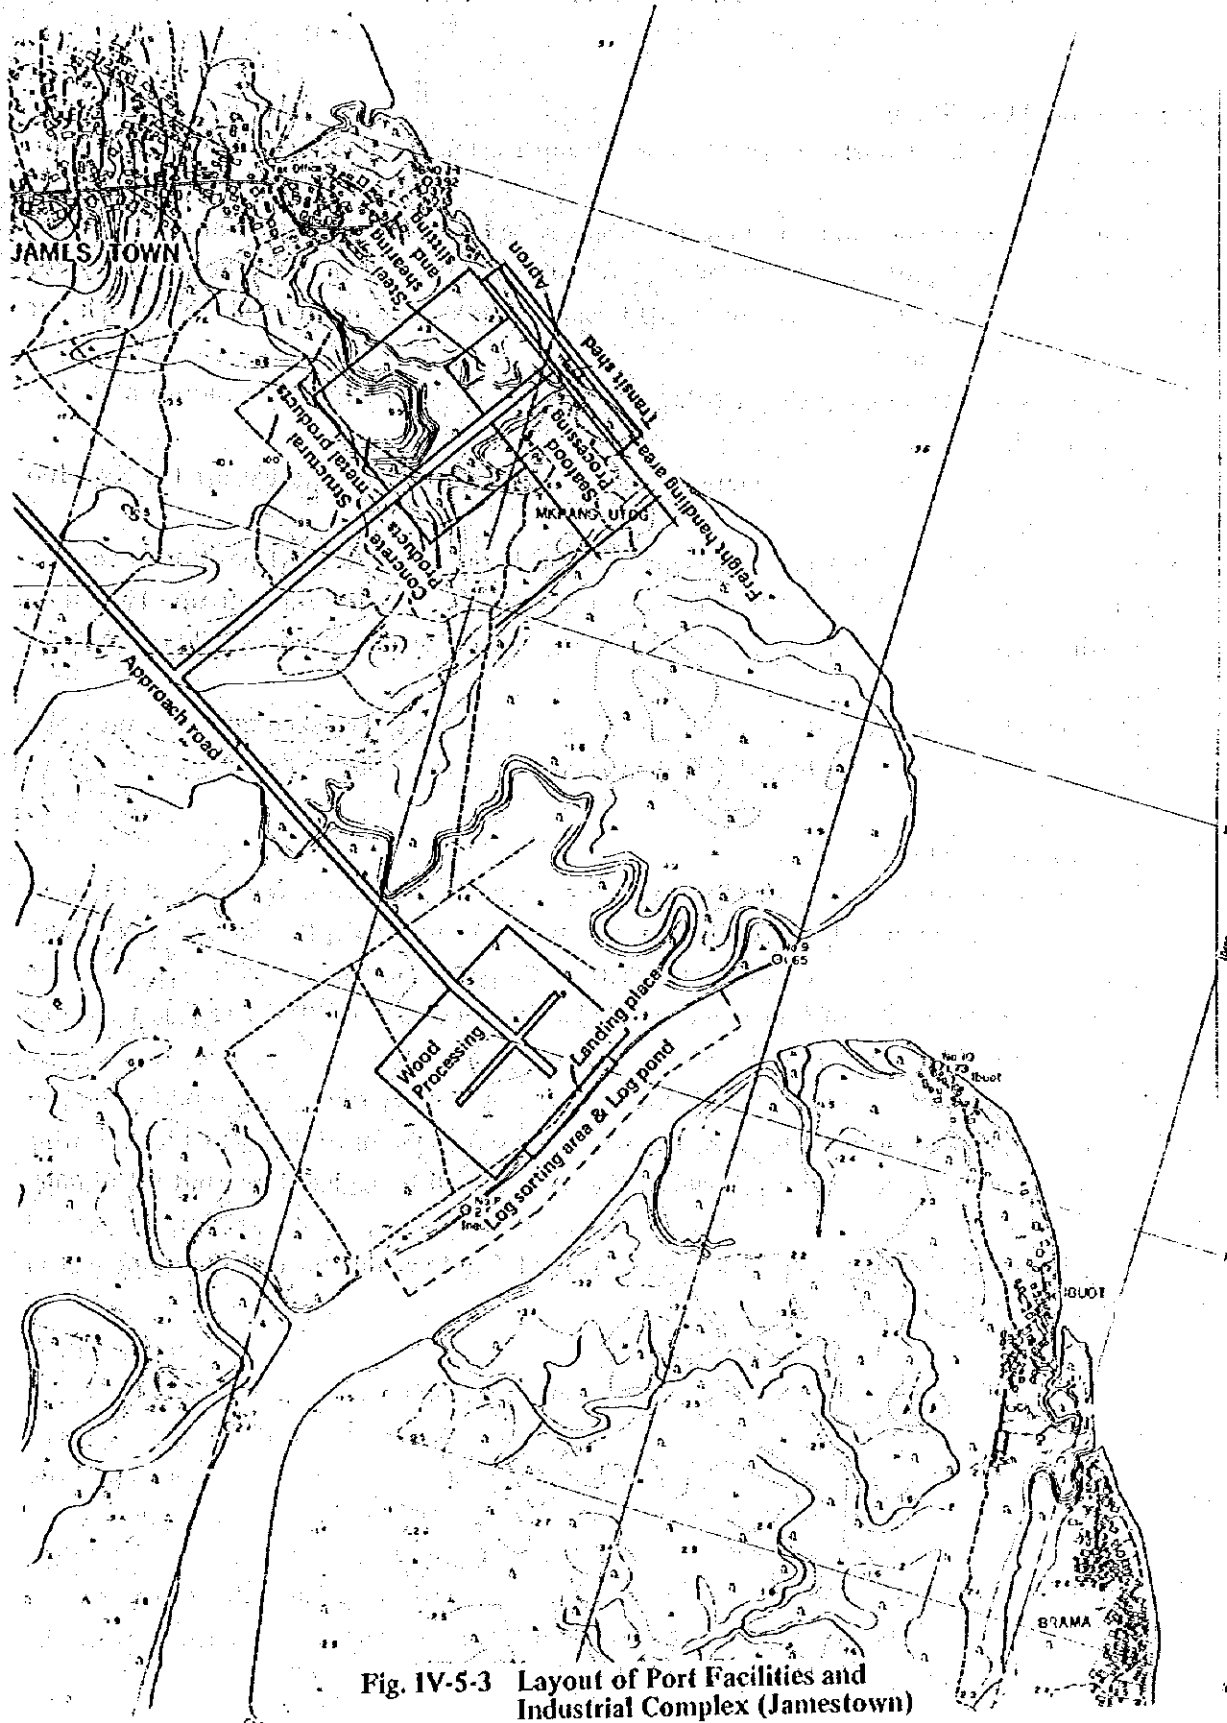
Layout of Port Facilities and Industrial Complex (Jamestown)
